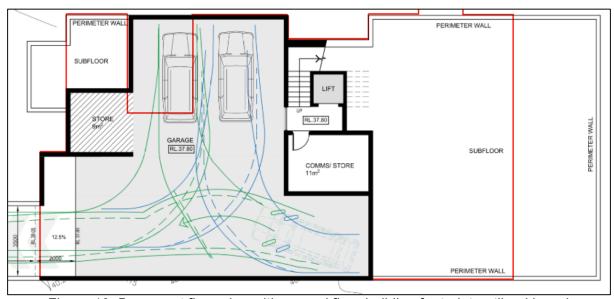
Basement floor plan with ground floor building footprint outlined in red
